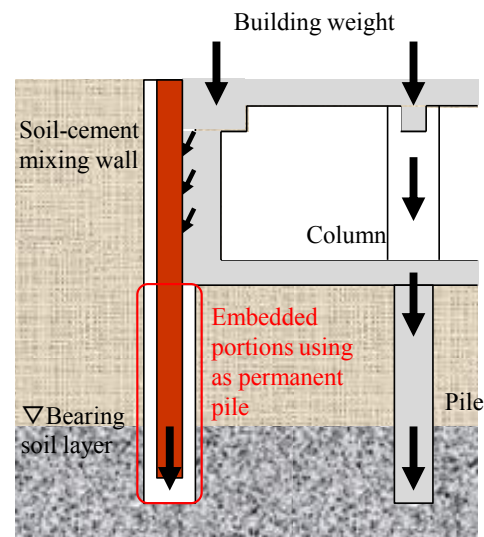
Concept of utilization for permanent pile of soil-cement mixing wall
